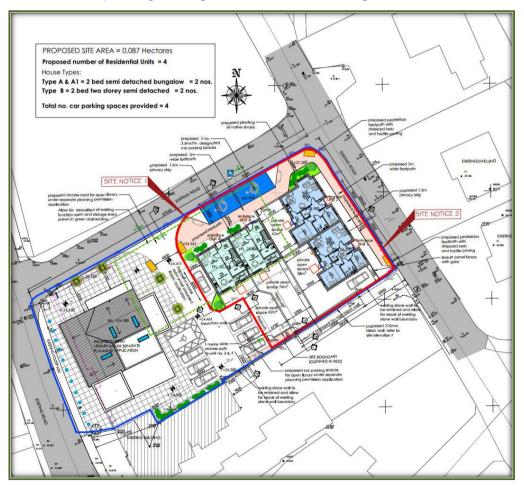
Extract from Planning Drawings (as Prepared by Sweeney Architects)
